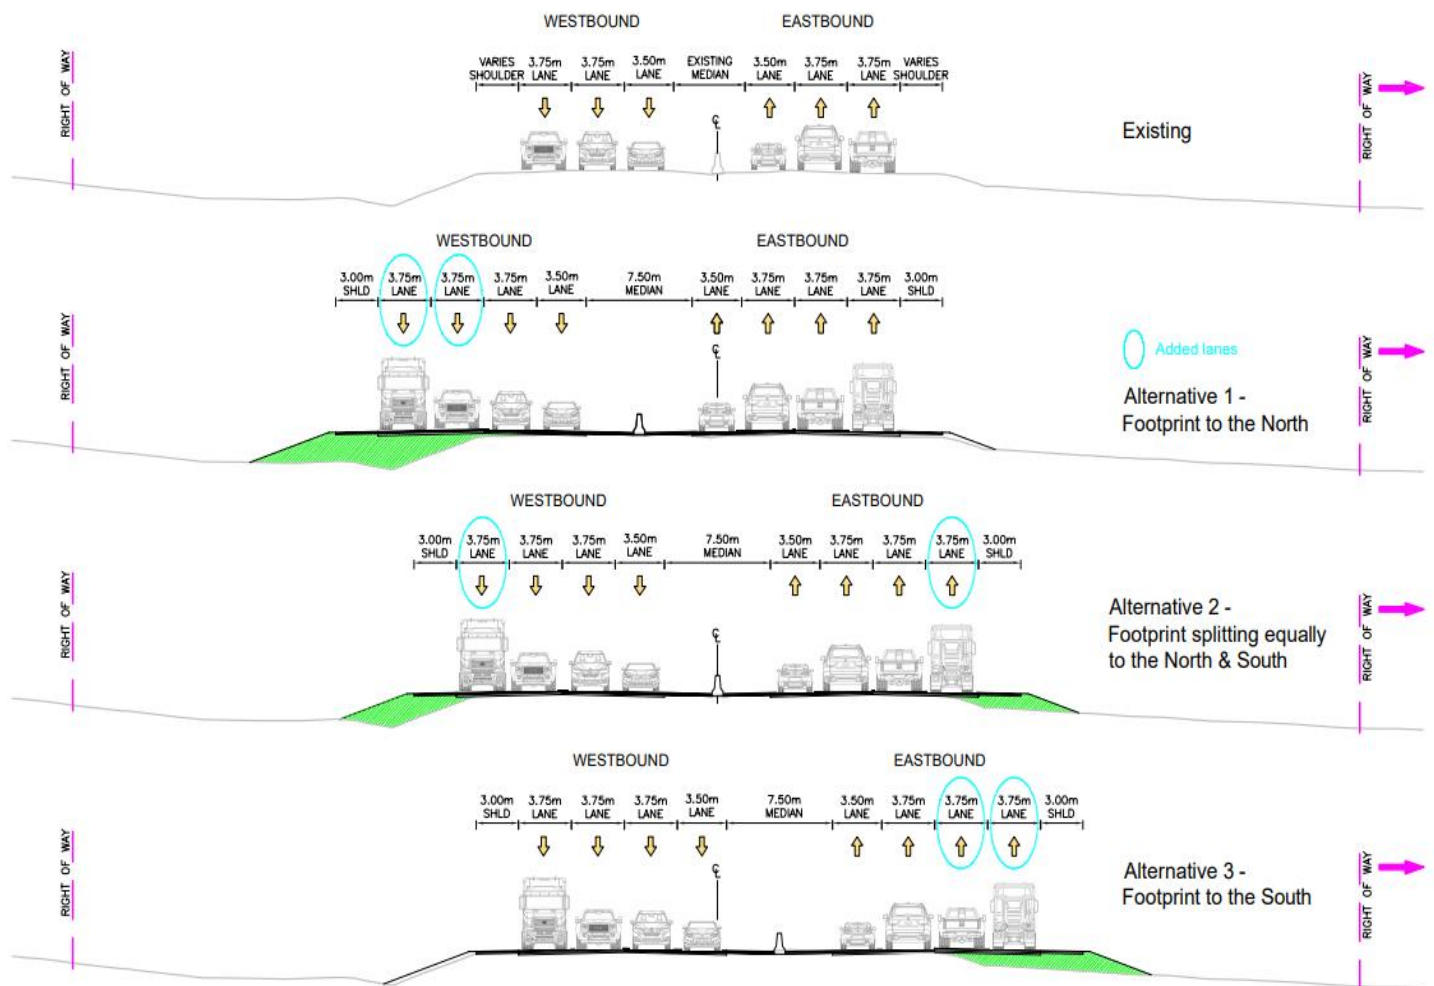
Section 3 – Existing Cross-Section and Future Footprint Alternatives Considered
